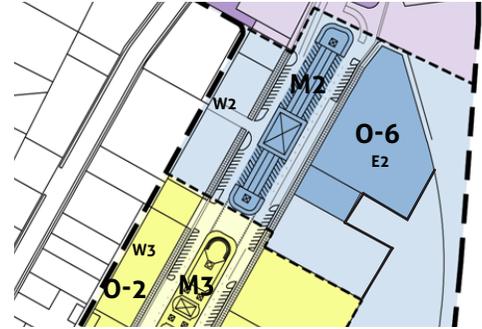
DISTRICT 2 KEY PLAN
